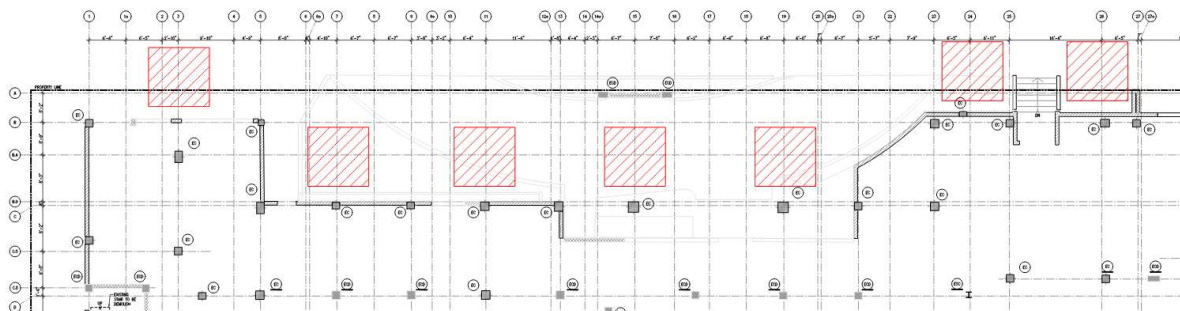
An example of a proposed layout for temporary steel tower locations is shown with red cross hatched boxes representing temporary steel towers outside of the existing building.
